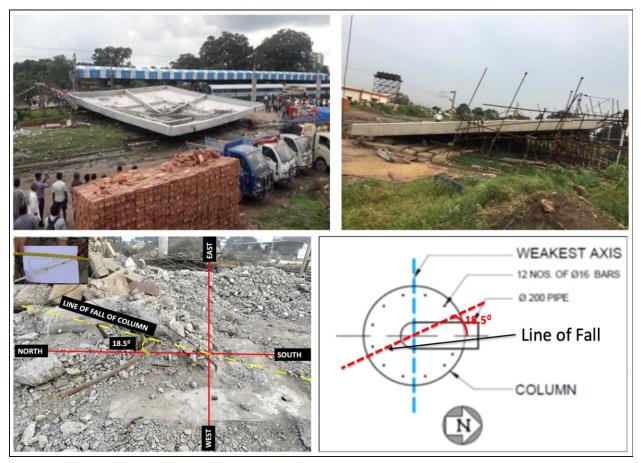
Collapsed COP showing roof, column and Line of Fall
